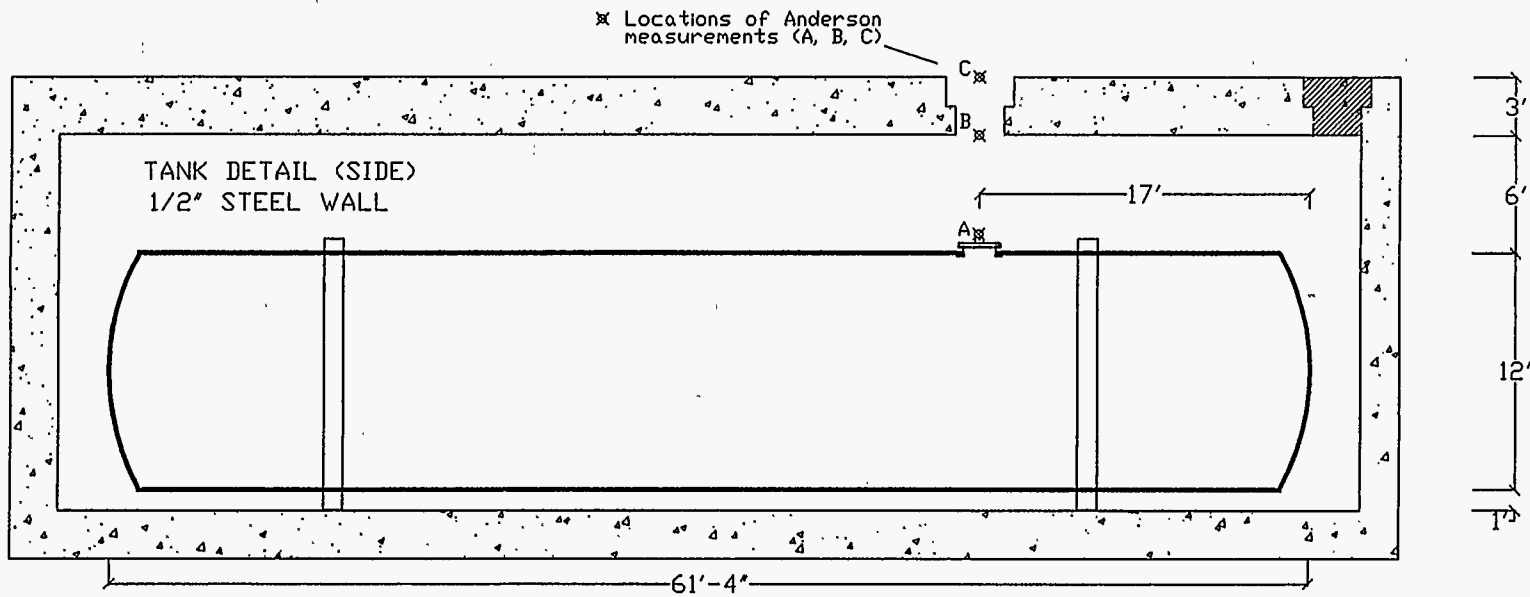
Side view of waste storage tank showing tank and vault wall detail. Drawing was compiled from existing ORNL engineering schematics for use in this report, and dimensions or completeness may not be accurate for any other purpose.
